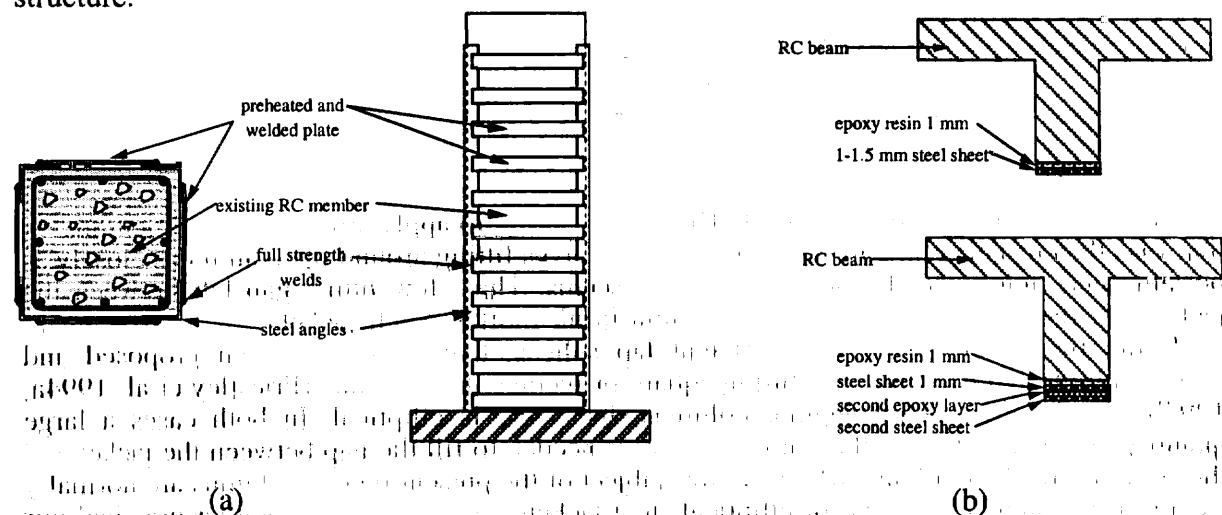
Use of steel plates in repair of (a) columns and (b) beams
